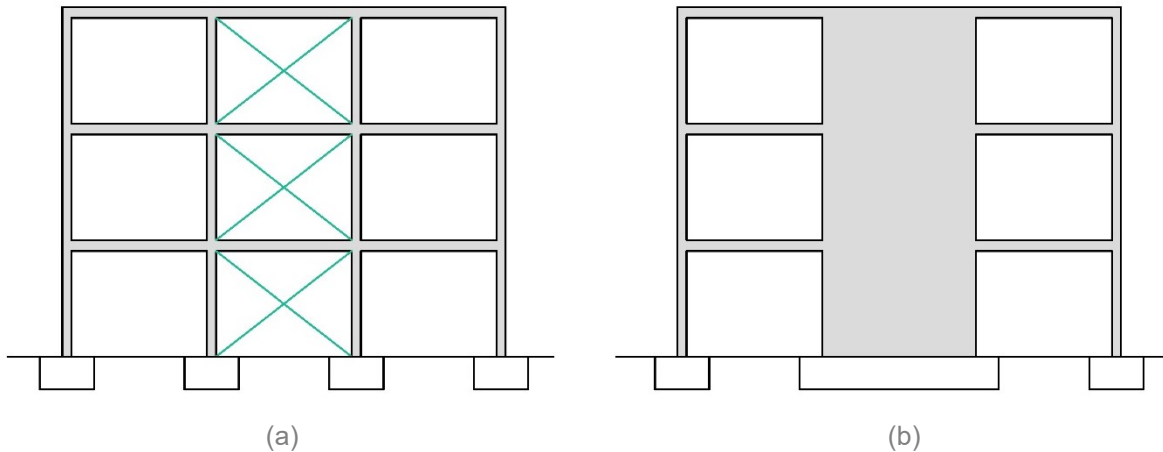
X-bracings (a) and shear walls (b) retrofitting techniques.
